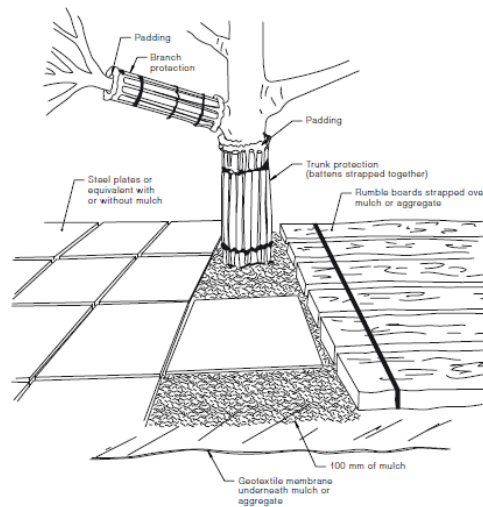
Example of trunk, branch and ground protection (Source: AS 4970-2009).
